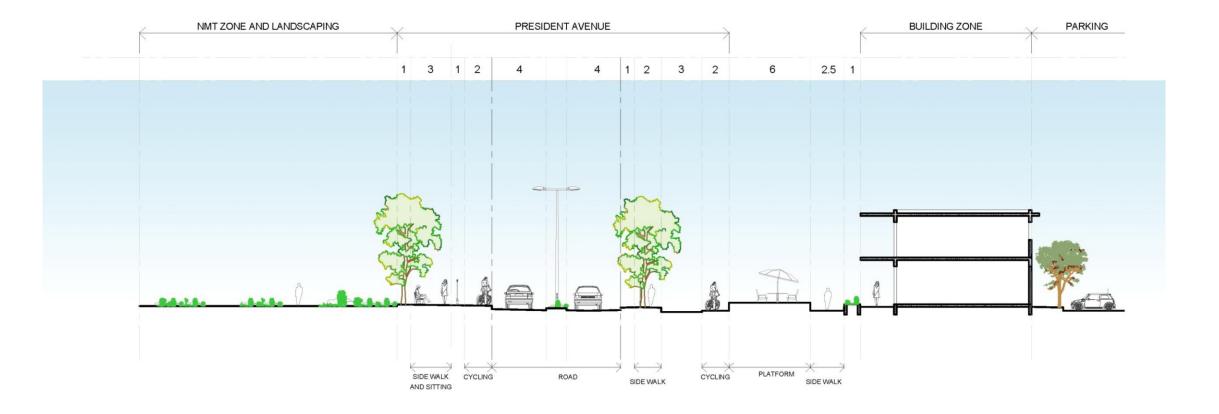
DETAILED PORTION OF KGAPHAMADI VISION PLAN
